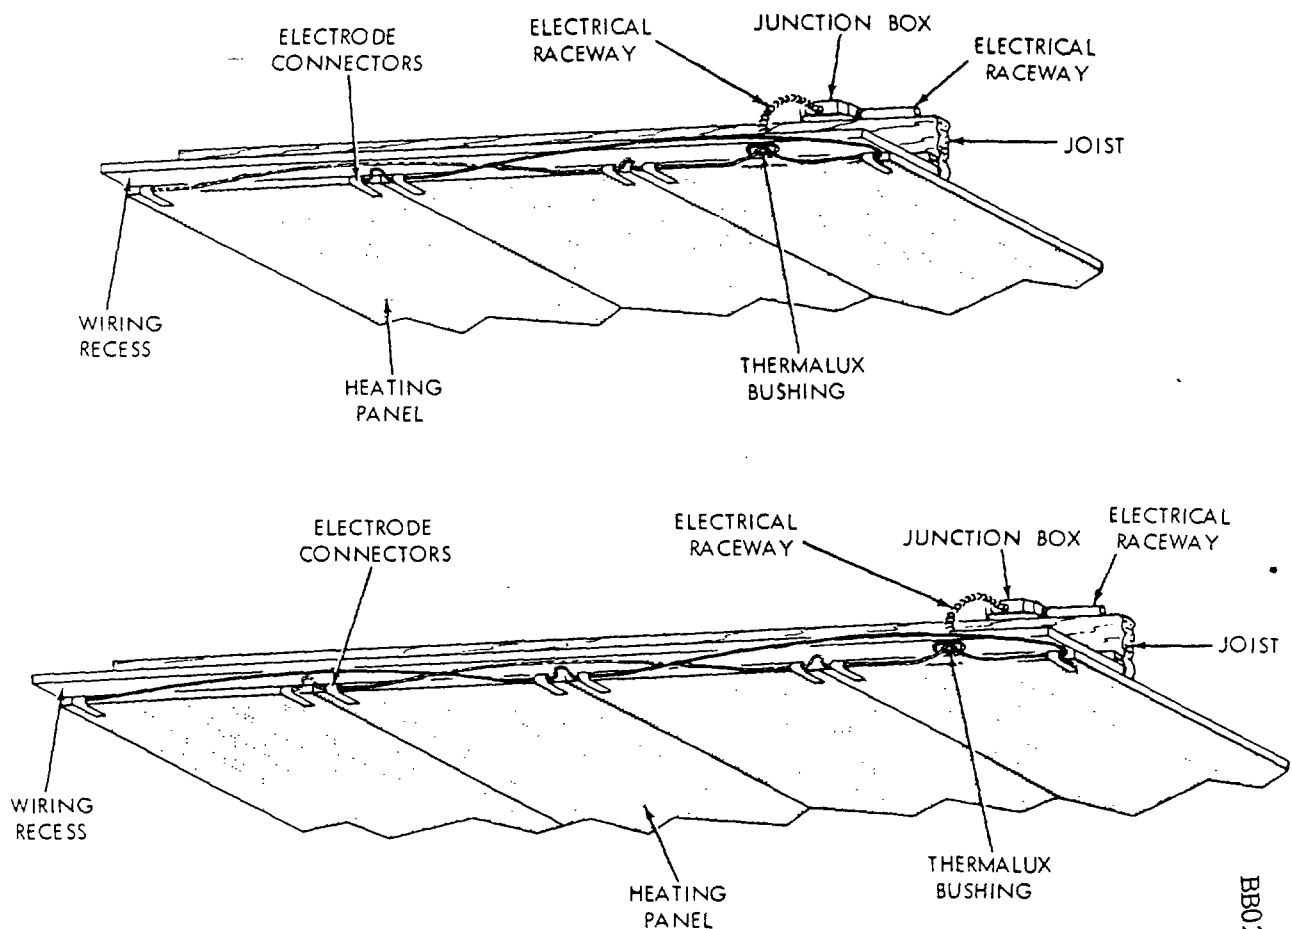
Typical Heating Panel Feeder Conductor Connections
